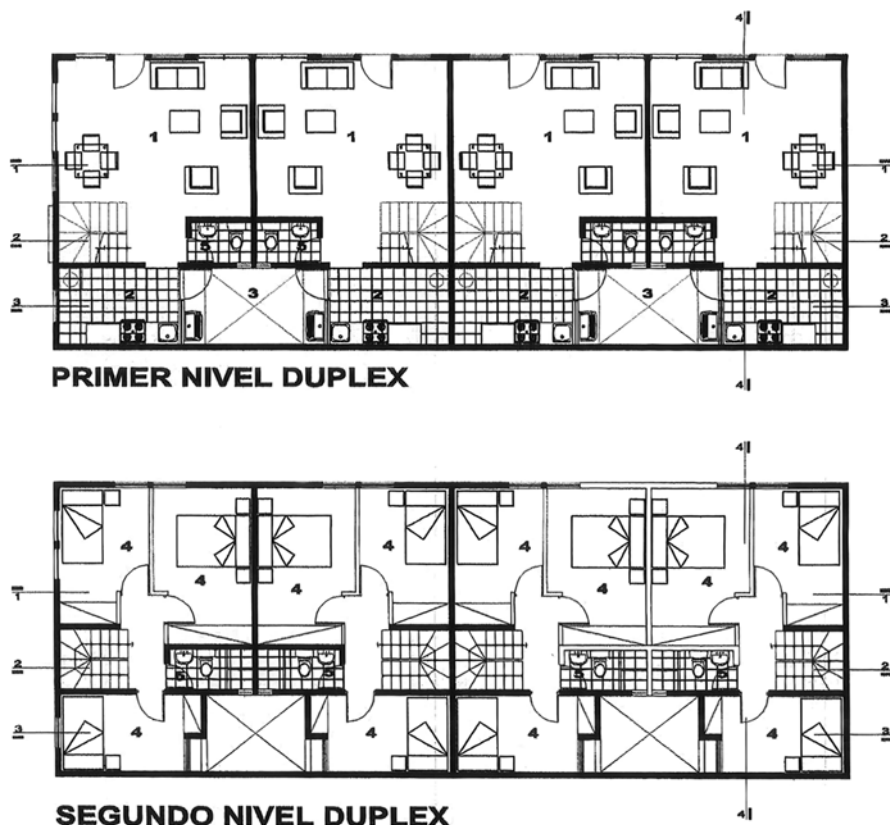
Duplex apartments floor plans of La Muralla Housing Complex. Source: Architect Luis Jiménez Campos Collection
